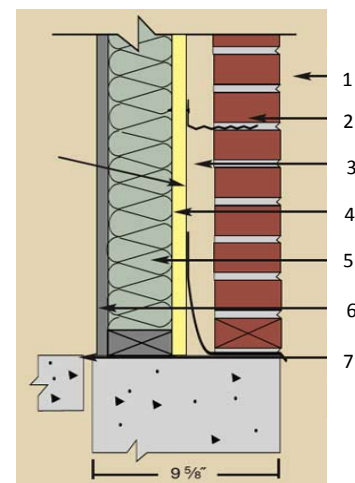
Typical wall section of a wood framed home with masonry exterior and thermal foam sheathing inter-membrane
